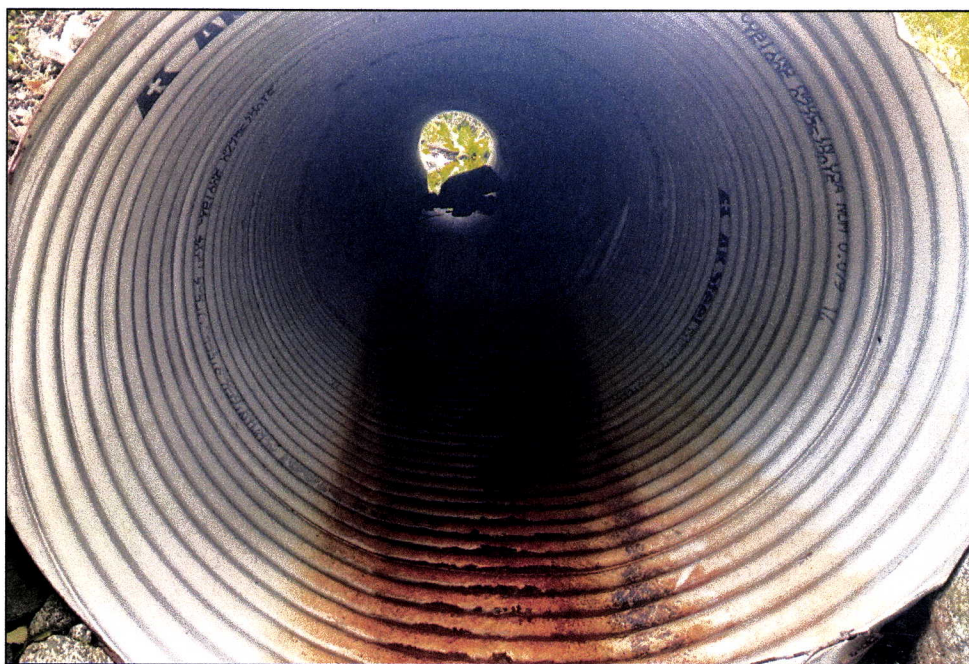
Culvert with low water flow looking upstream at waypoint 439.
